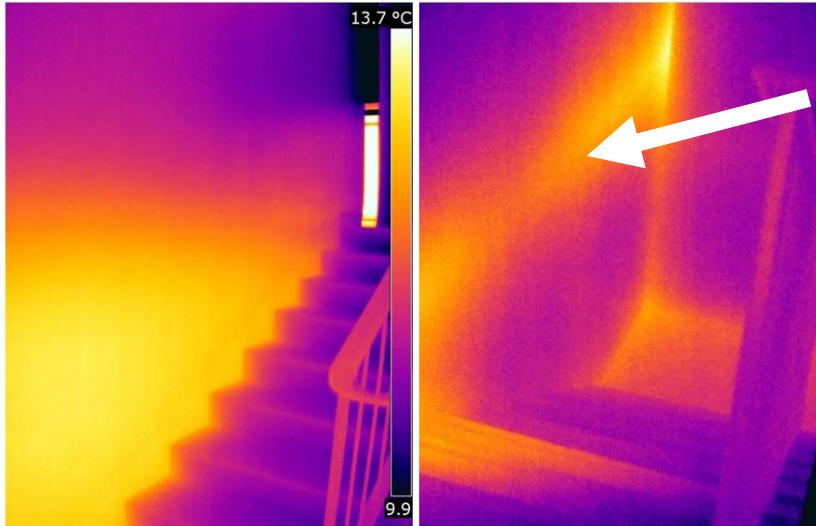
Heat loss through soffits above open walkways (left: pre-renovation and right: post-renovation).
